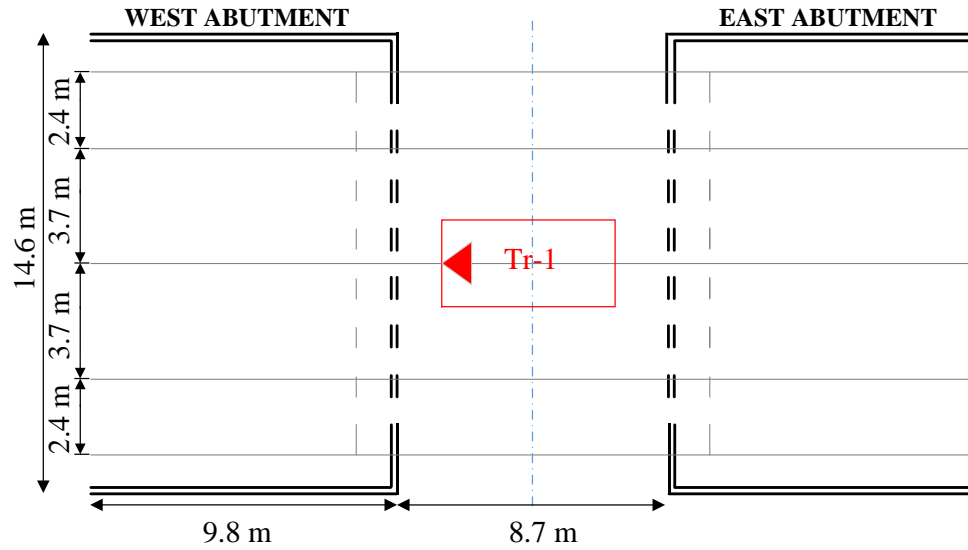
Live load test, truck position number 5 (P5) – single truck facing west. Used for Live Load Test No. 11.
